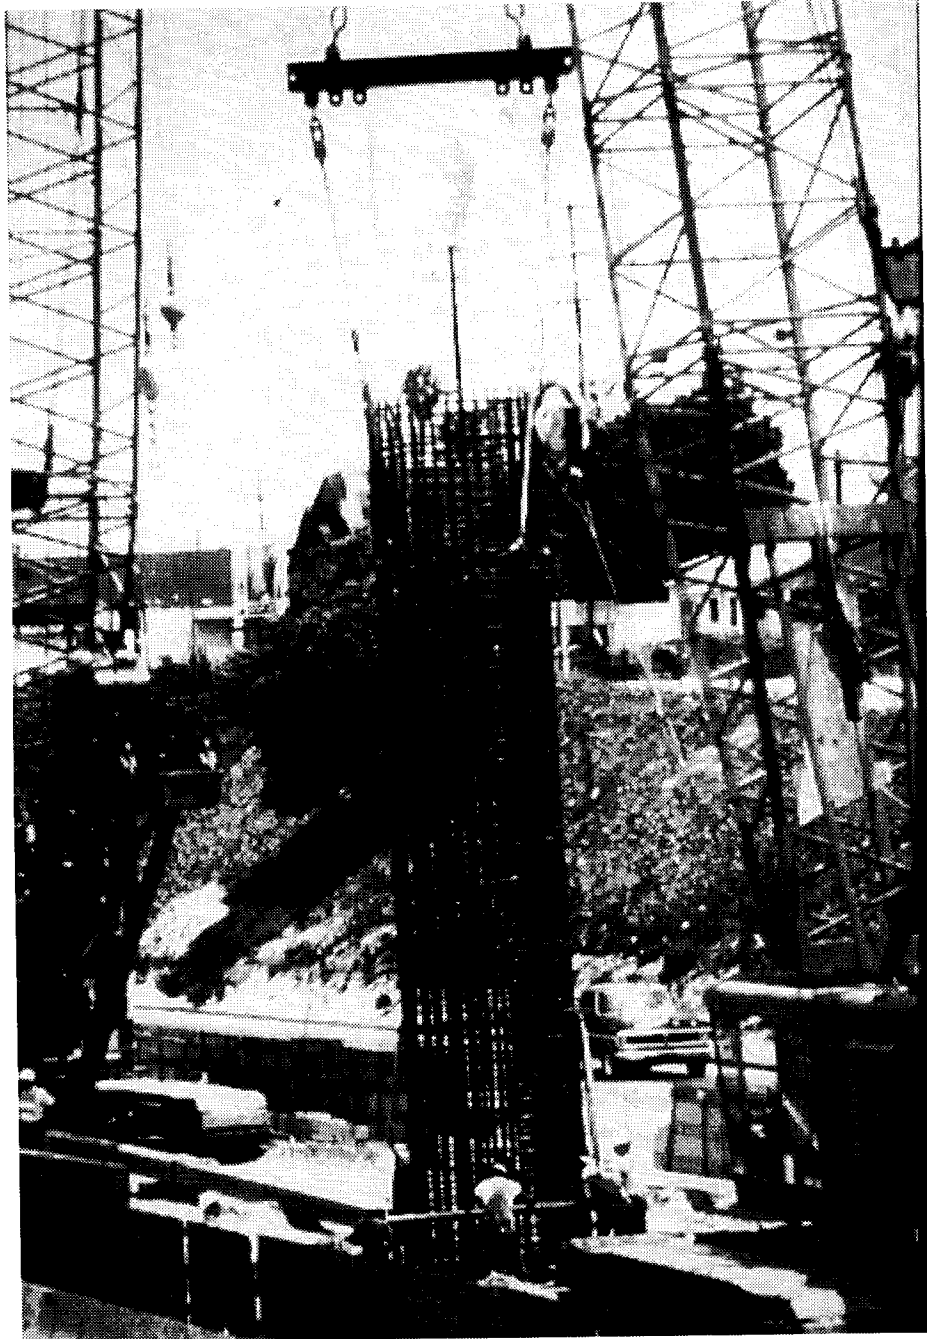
Reinforcing Steel Pattern for Ductile Column
